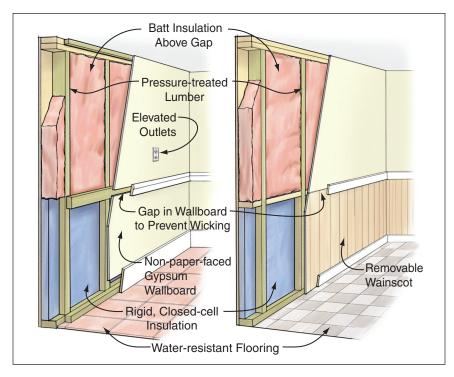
Recommended wet floodproofing techniques for interior wall construction. The following flood damage-resistant materials and methods will prevent wicking and limit flood damage: 1) construct walls with horizontal gaps in wallboard; 2) use non-paper-faced gypsum wallboard below gap, painted with latex paint; 3) use rigid, closed-cell insulation in lower portion of walls; 4) use water-resistant flooring with waterproof adhesive; and 5) use pressure treated wood framing (Source: LSU AgCenter and Coastal Contractor Magazine).
